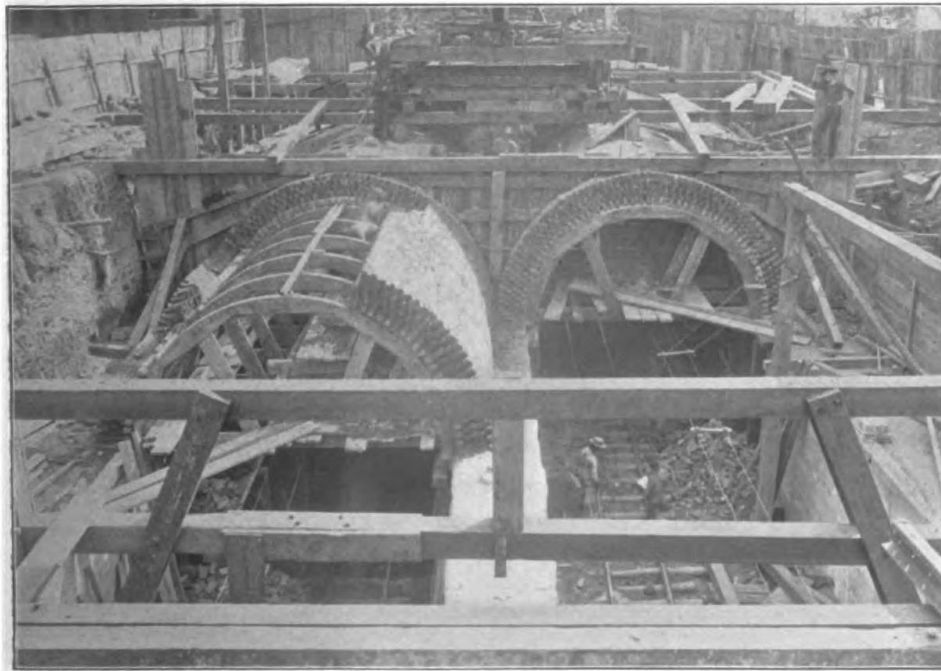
Open cut section of First Street Tunnel construction, showing arches. Source: From William F. Strouse, "The Reconstruction of the Passenger Terminals at Washington, D.C." Transactions of the American Society of Civil Engineers 71 (1911): 137.
